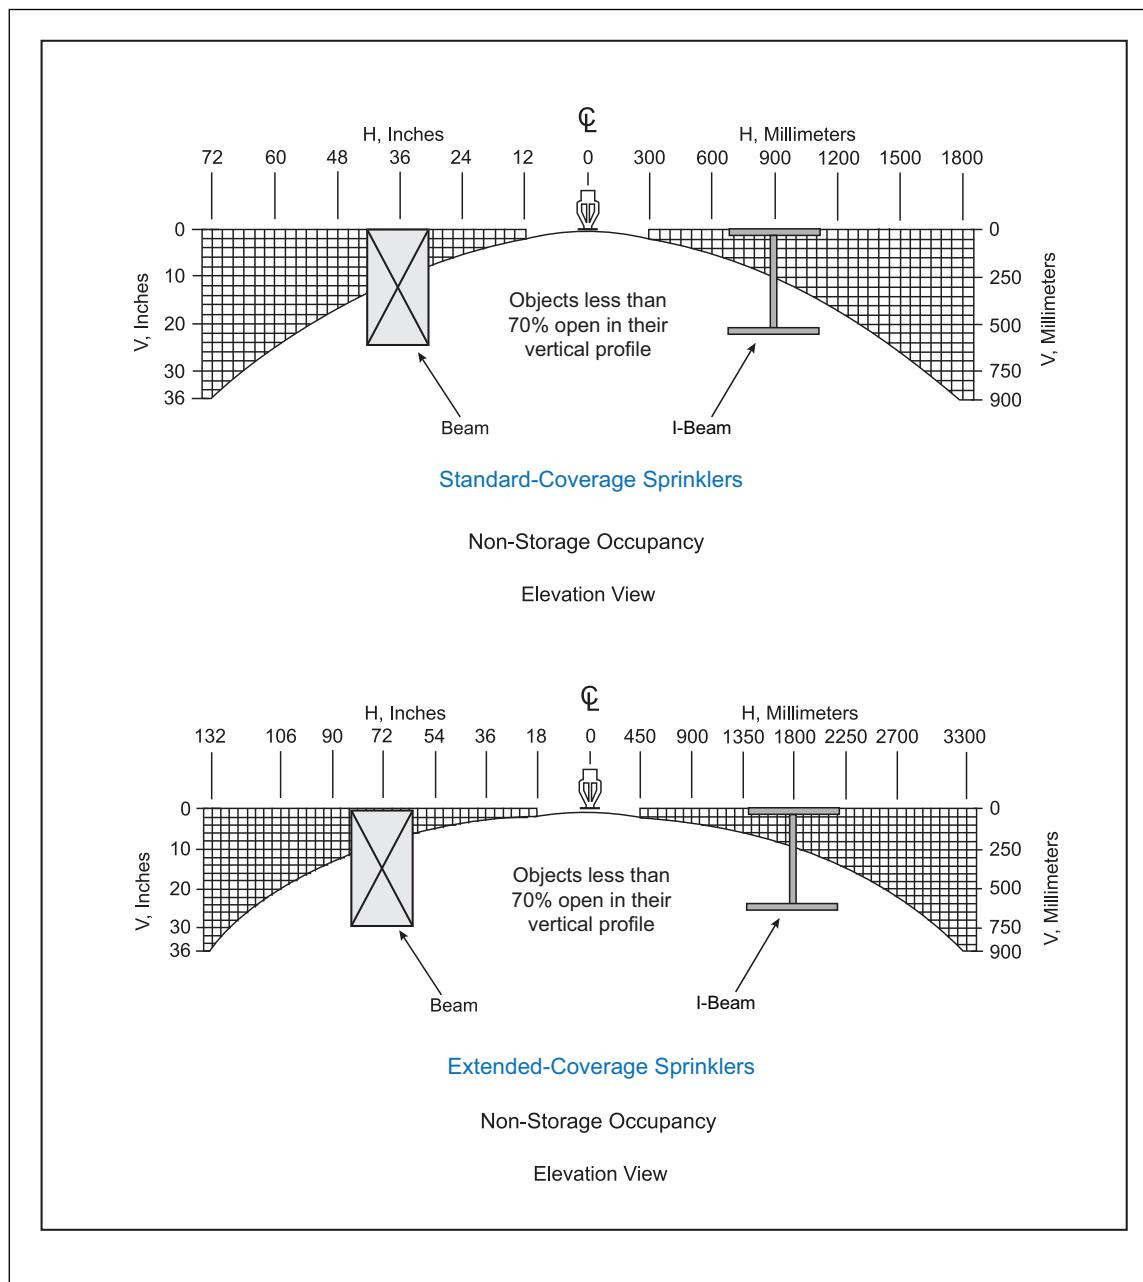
(a). Example of ceiling structural members that obstruct sprinkler discharge pattern
